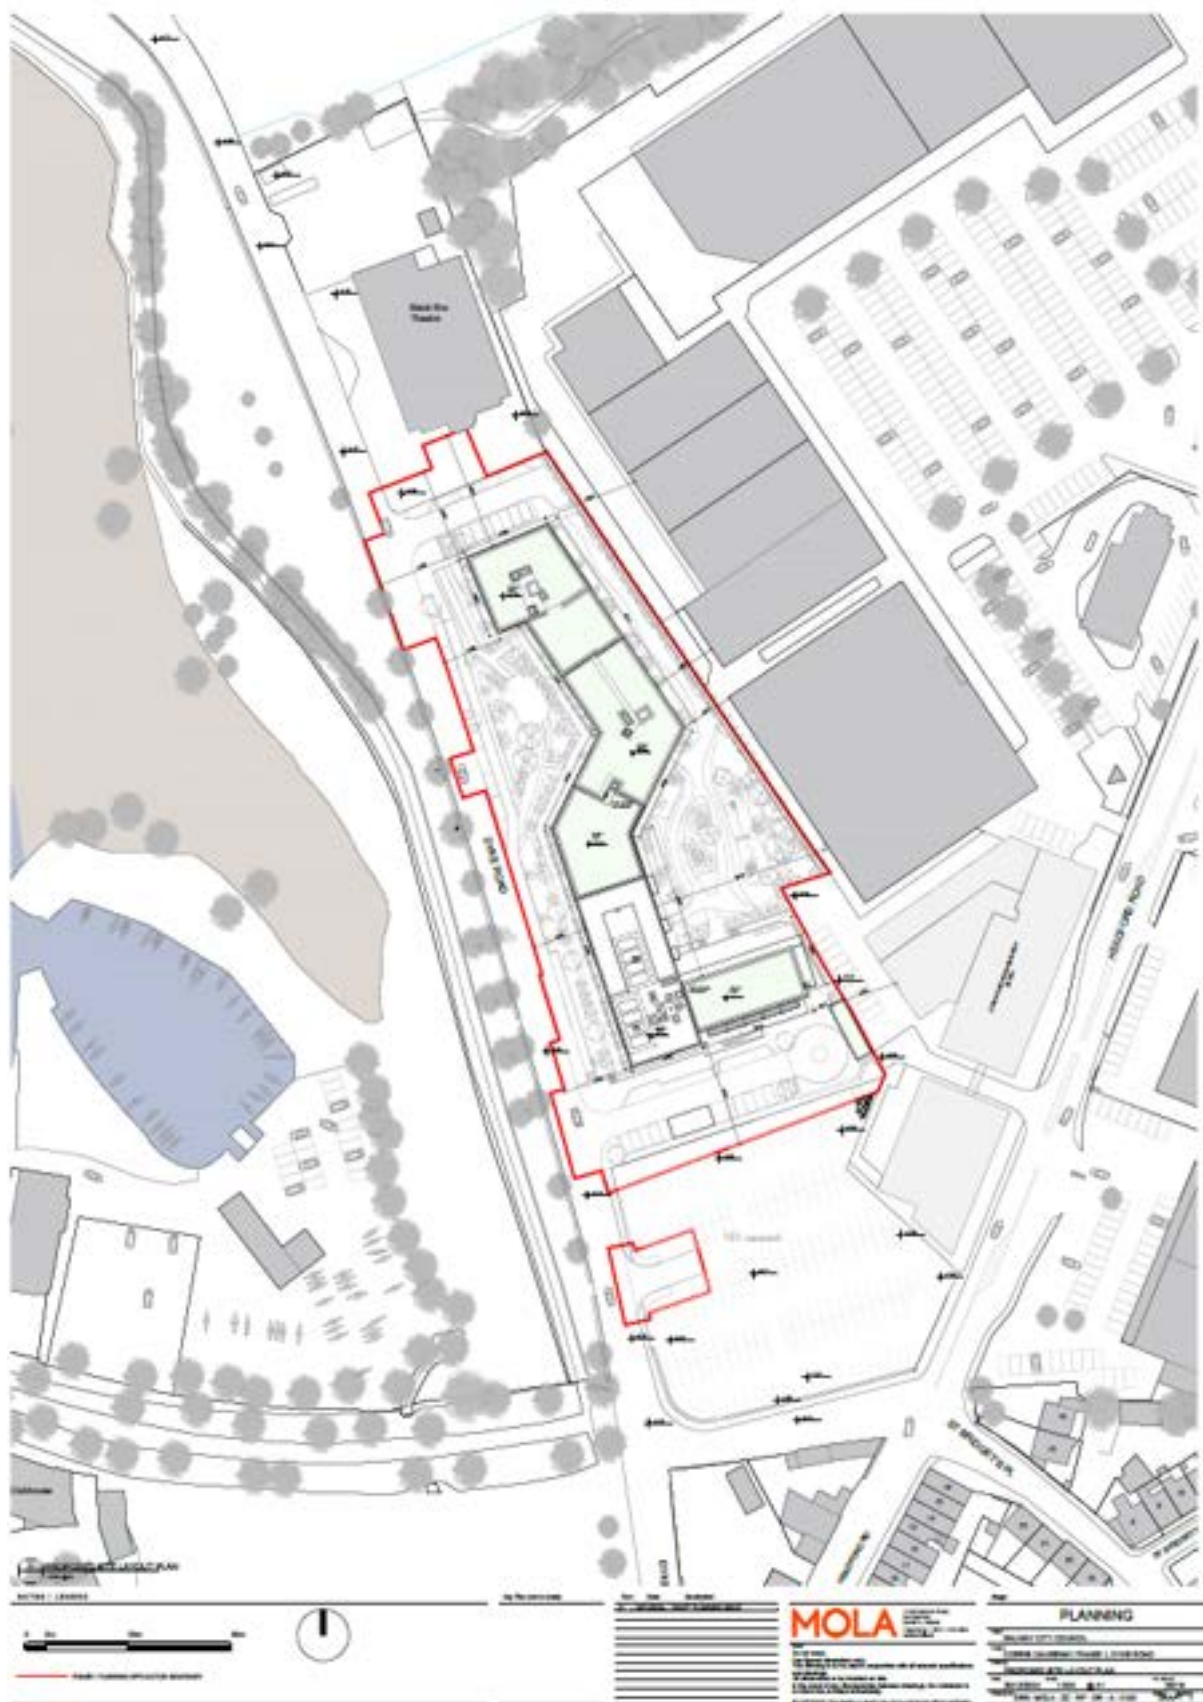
Proposed Development Site Layout (MOLA, 2024)
